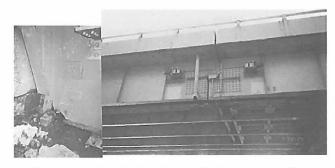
This plate girder bridge on the JR Joetsu Line is in fairly good condition, but a bolt securing a railroad tie fell out.
